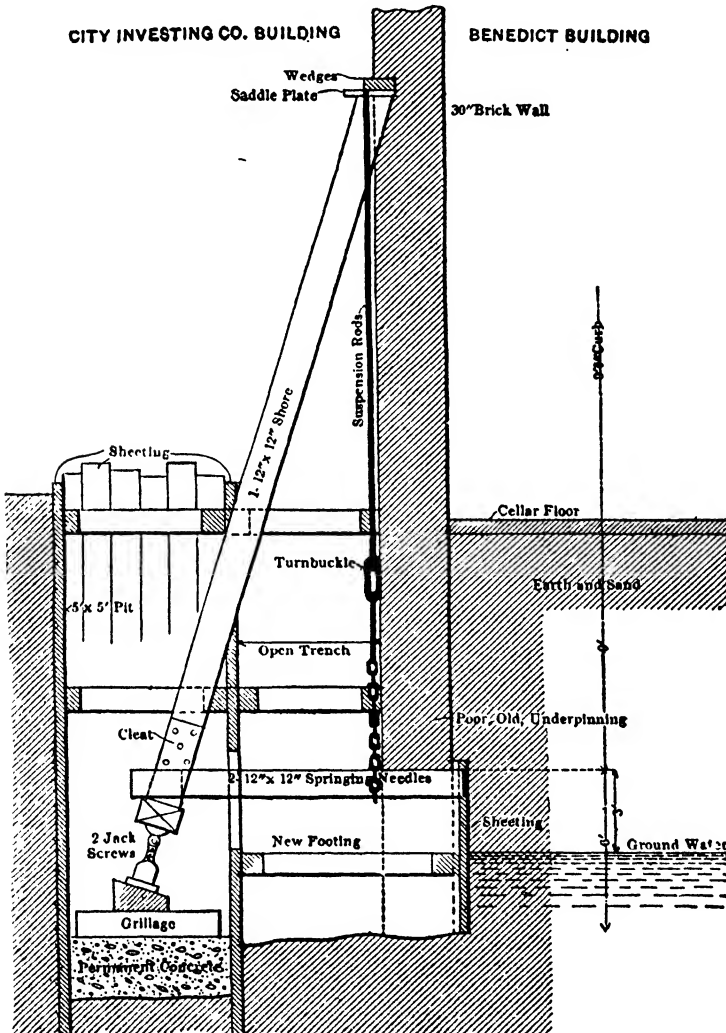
Underpinning with Figure-4 Needle Method, Benedict Building, New York City.
